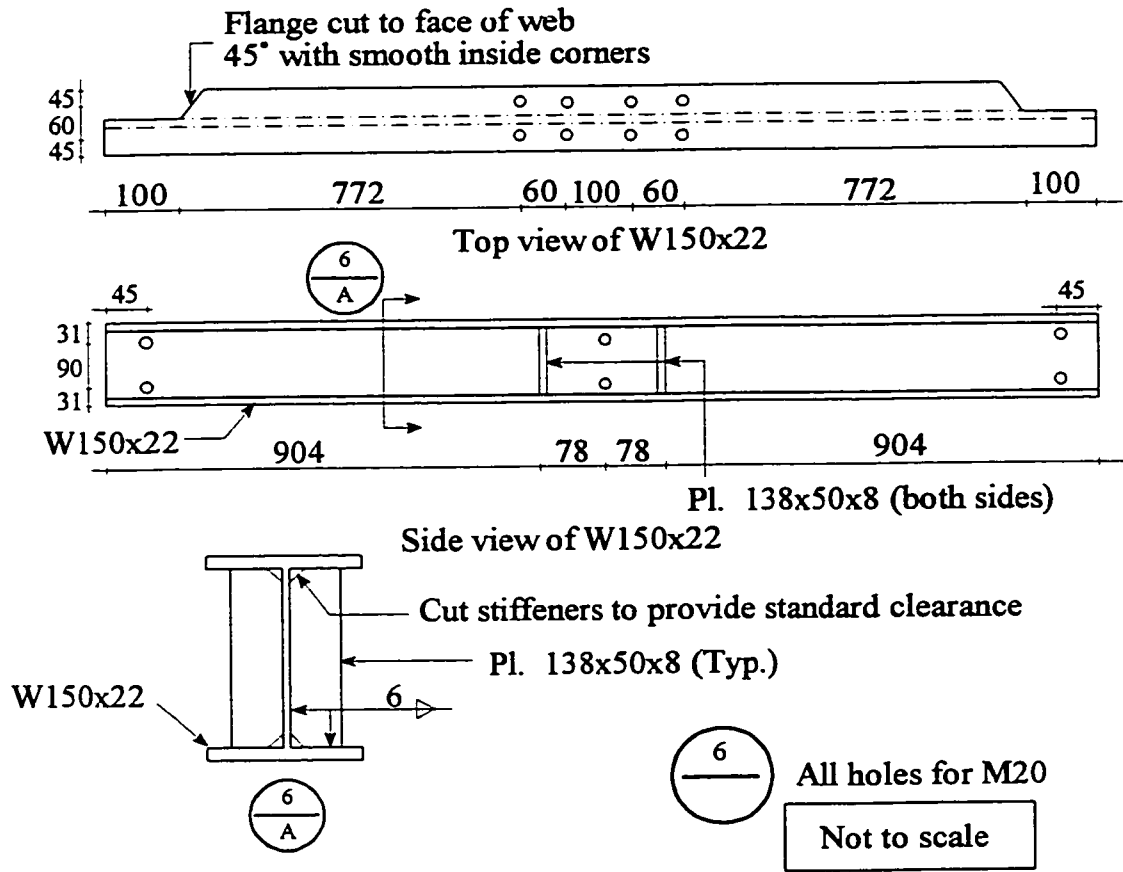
Bottom beam and its detailing for the TADAS specimen.
